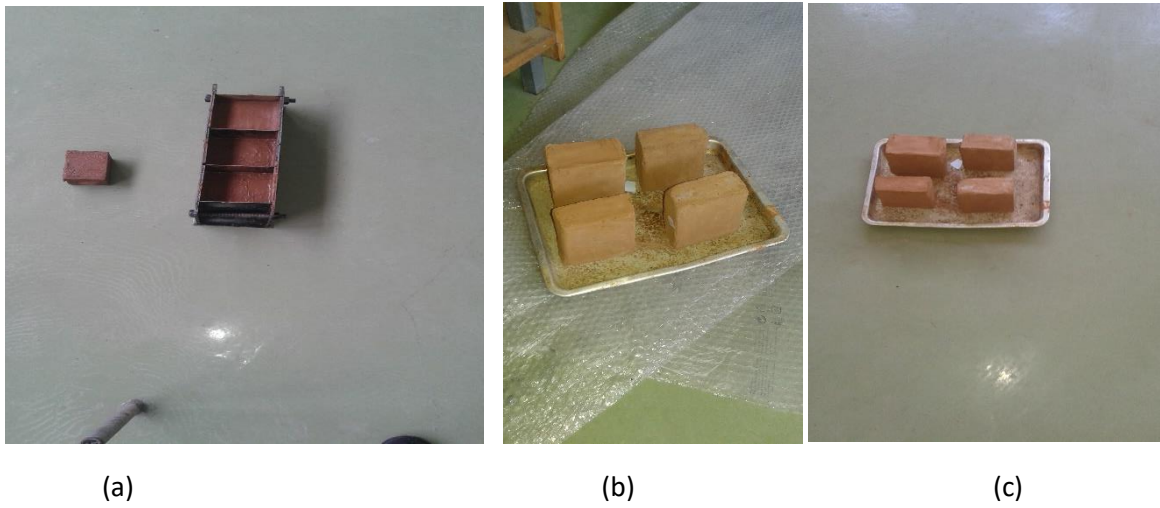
Brick moulding (a) during air drying in the lab room (b) bricks after fired in a furnace (c)
